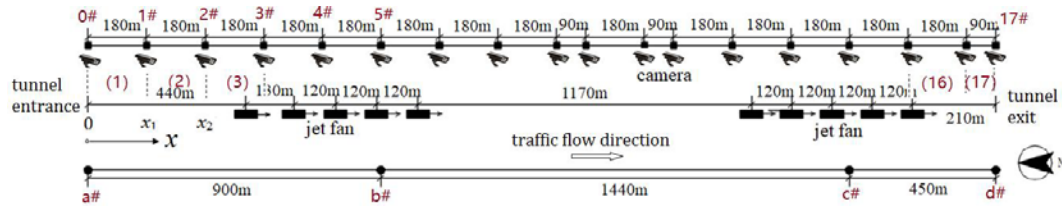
Longitudinal measuring points, camera and jet fan layouts
